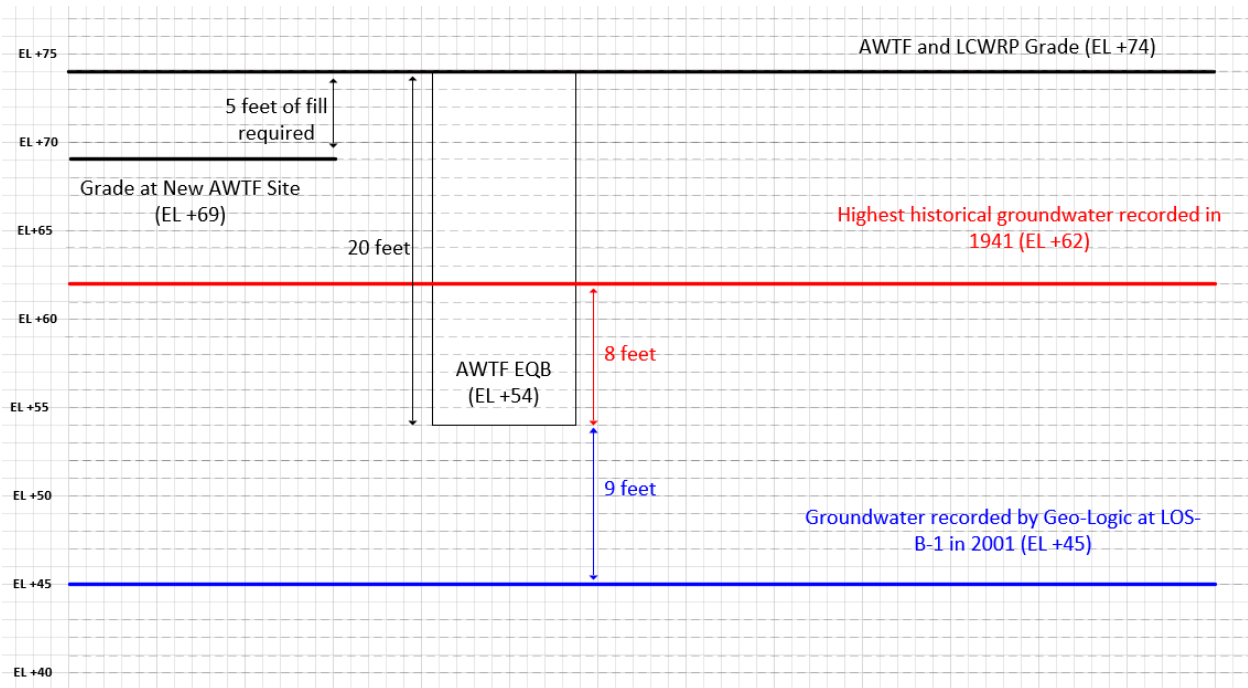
Groundwater Profile at the Los Coyotes Water Reclamation Plant Site
